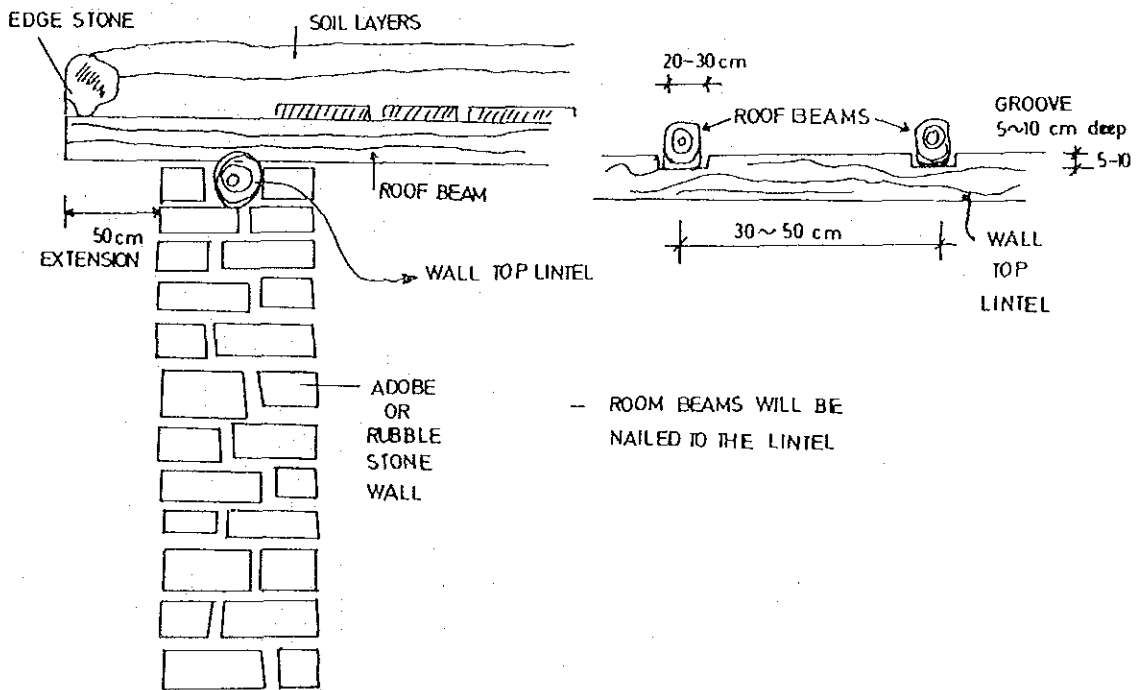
Improved Roof Beam-Wall Lintel Connection.
